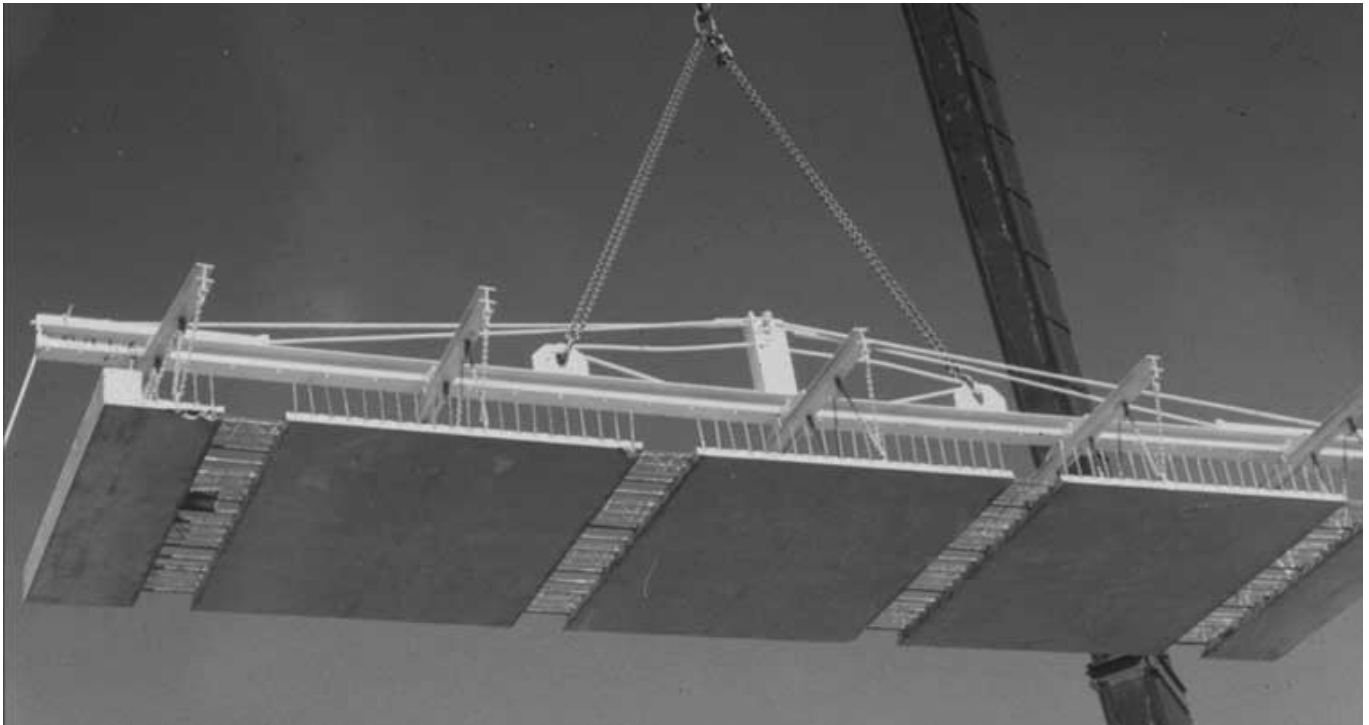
Ready made bridges - HumeSlab™ bridge deck panel being lifted into position
